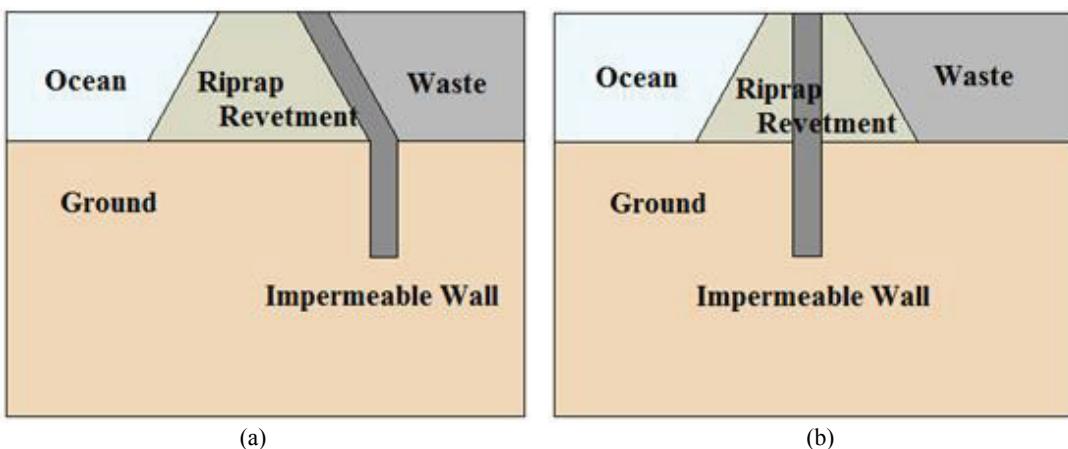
Schematic view of the ocean disposal site: (a) Constructed using the current method (an impermeable wall with impermeable sheet); (b) Constructed using the CCC method.
